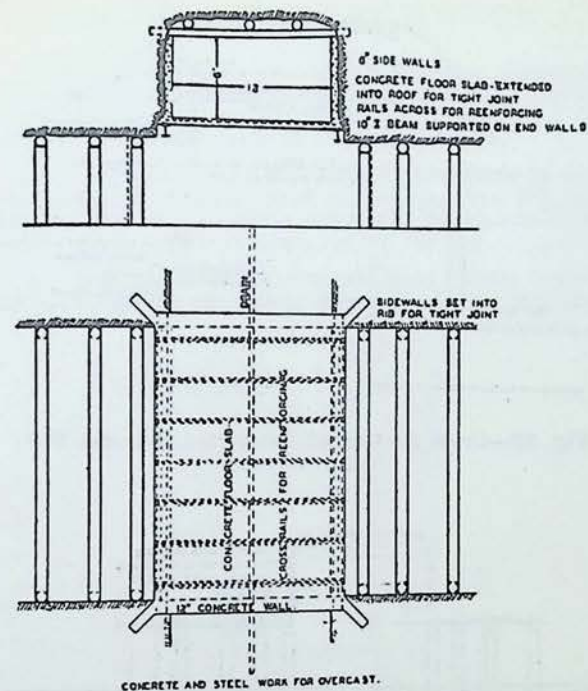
Reinforced Concrete Slab Supported by I Beams. This Method To Be Used Under Heavy Cover Conditions.
